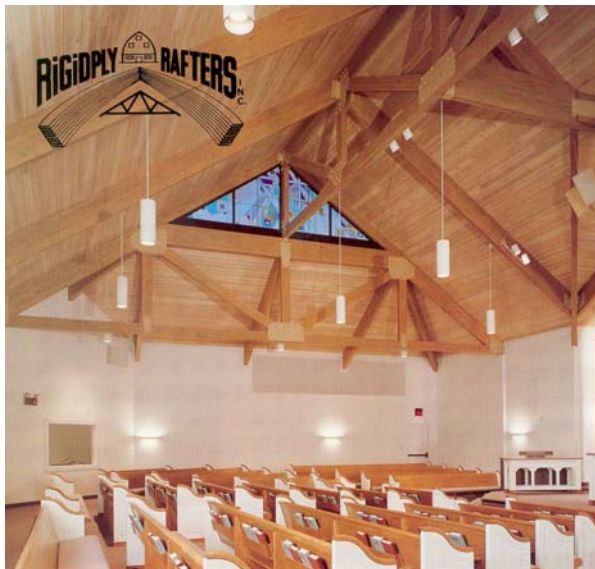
THE USE OF HEAVY TIMBER TRUSSES (RIGIDPLY RAFTERS)
